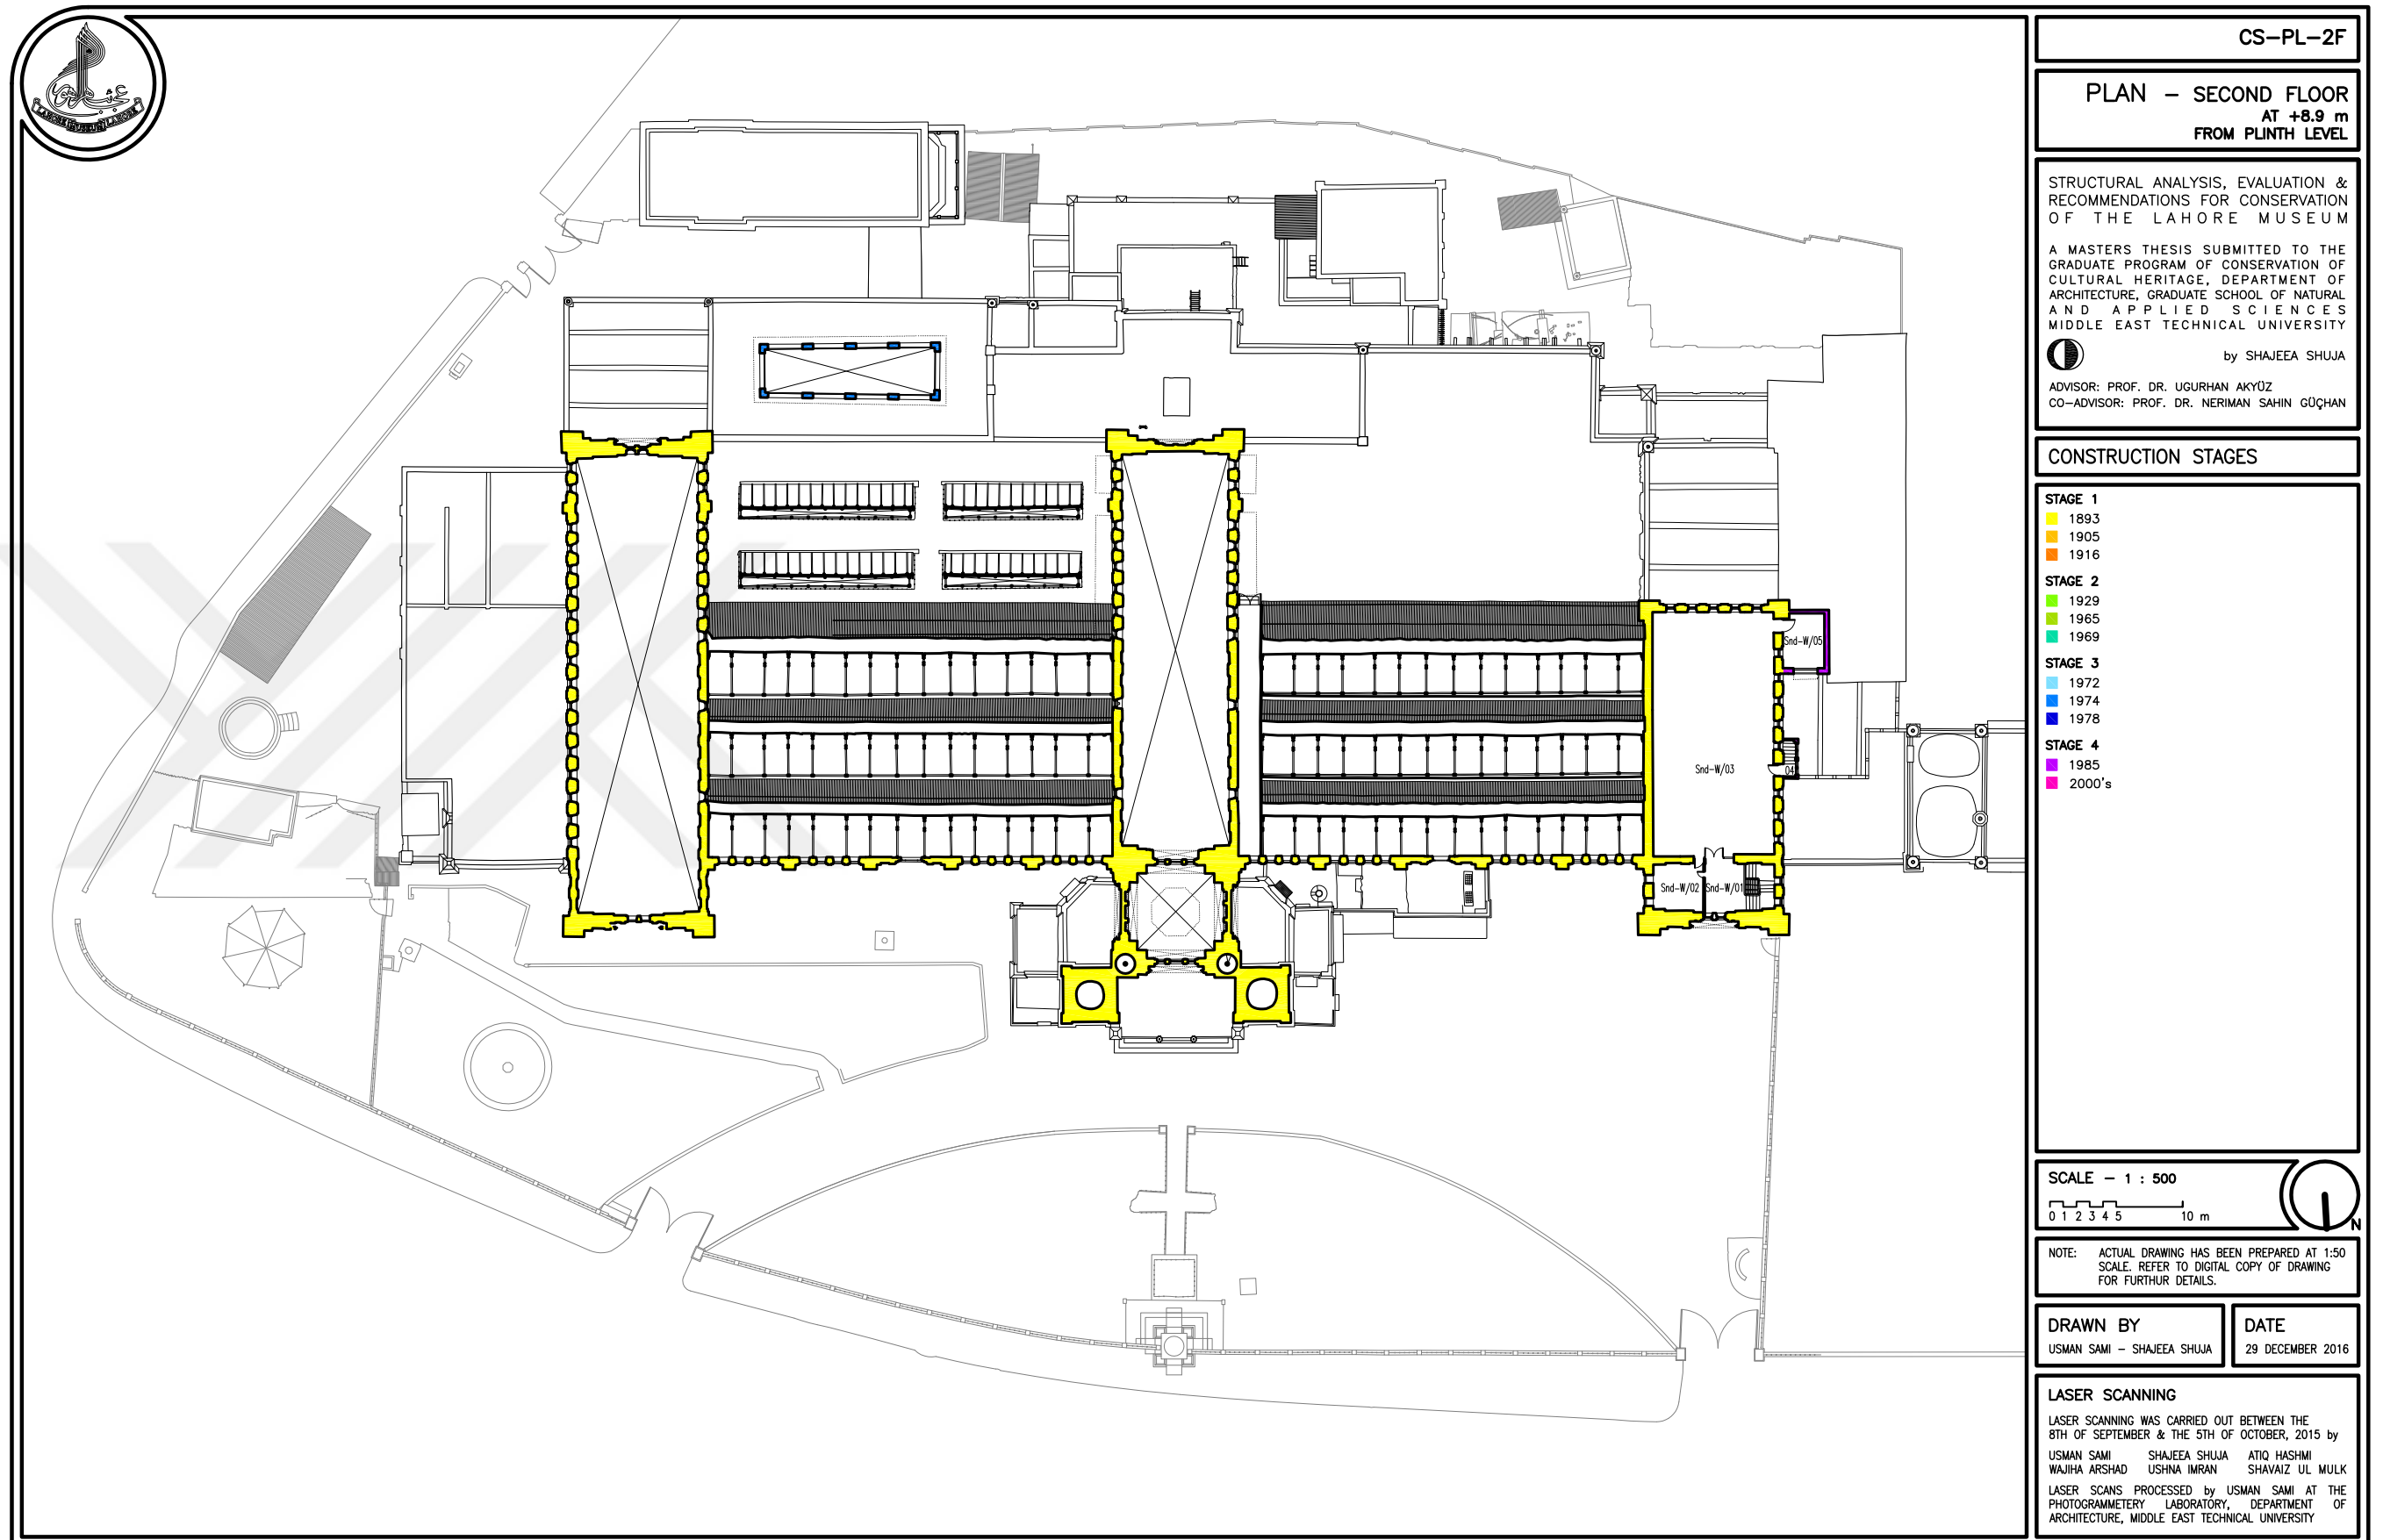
CS-PL-2F – Construction Stages – Plan – Second Floor (2017)
